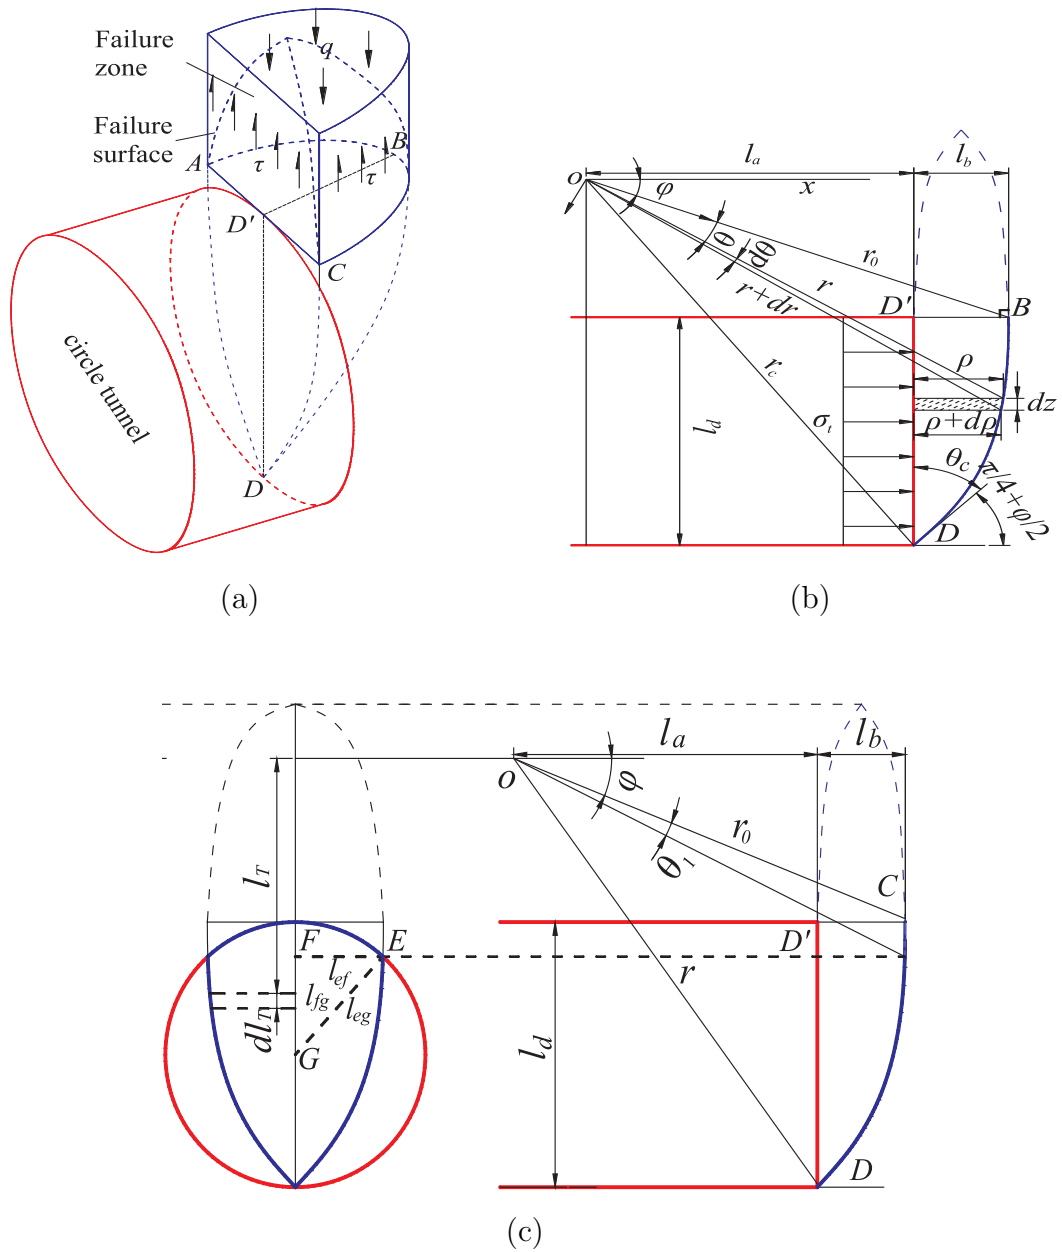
3D model for tunnel face stability, Liu et al. (2019): (a) 3D failure mechanism; (b) Rotational failure zone; (c) geometric relationships between the slip surface and tunnel face
